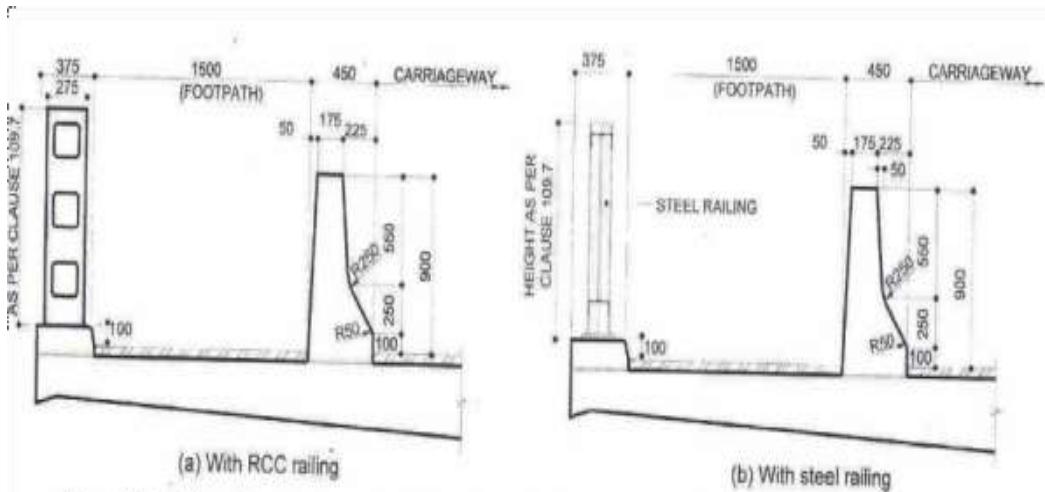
Details of Concrete Crash Barrier & Railing for showing Bridge with Footpath
